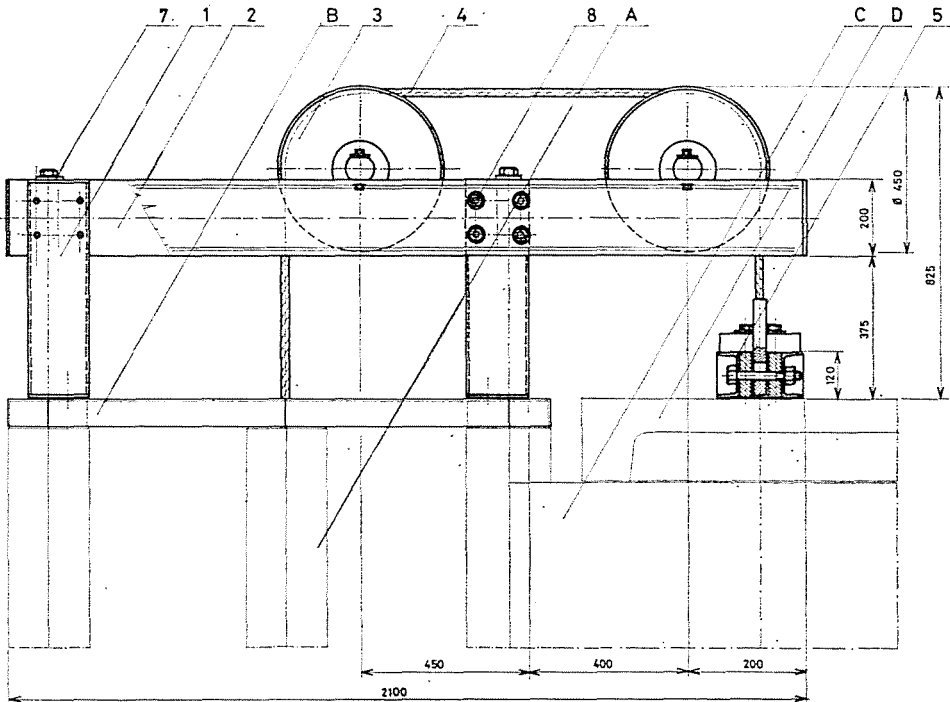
Lifting equipment integrated with the structure: lifting cantilever jointable in four positions to columns of the uppermost pillar skeleton-frame and lifting bridge fixed to the lifting points of cellular floor-fields. Section. A. column element of pillar skeleton-frame; B. upper cradle of pillar skeleton-frame; C. beam element of beam box-frame; D. the uppermost cellular floor-field lifted; 1. leg; 2. lifting cantilever; 3. ropewheel; 4. lifting rope; 5. lifting bridge
